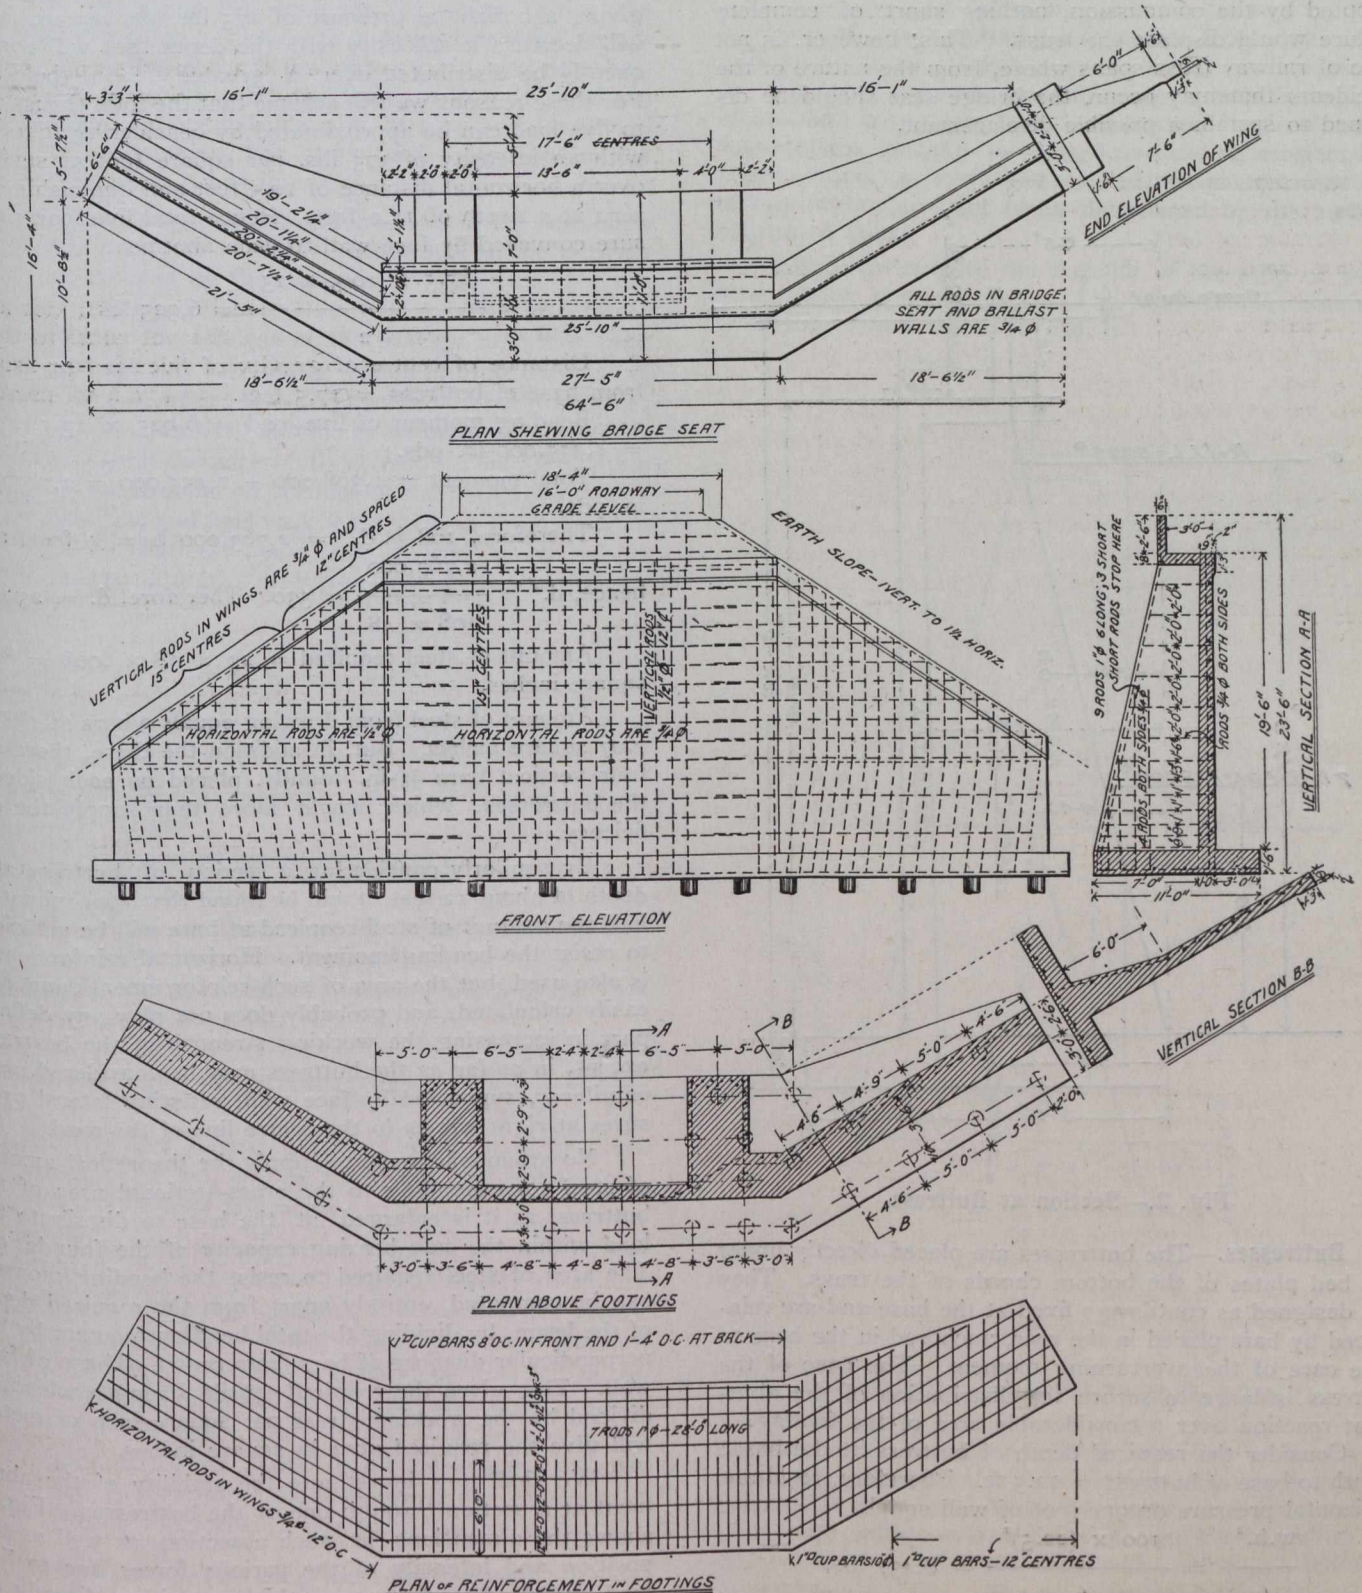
Standard Reinforced Concrete Abutment; Board of Highway Commissioners, Saskatchewan.
